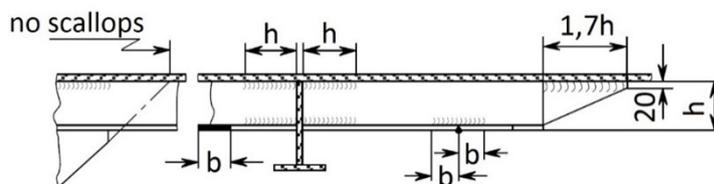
Welds at the ends of girders and stiffeners
